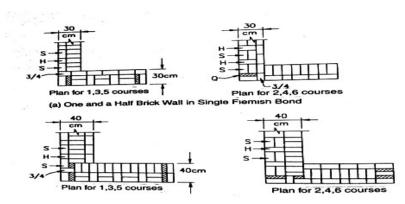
Plan of one and half brick thick and two brick thick wall in Flemish bond
